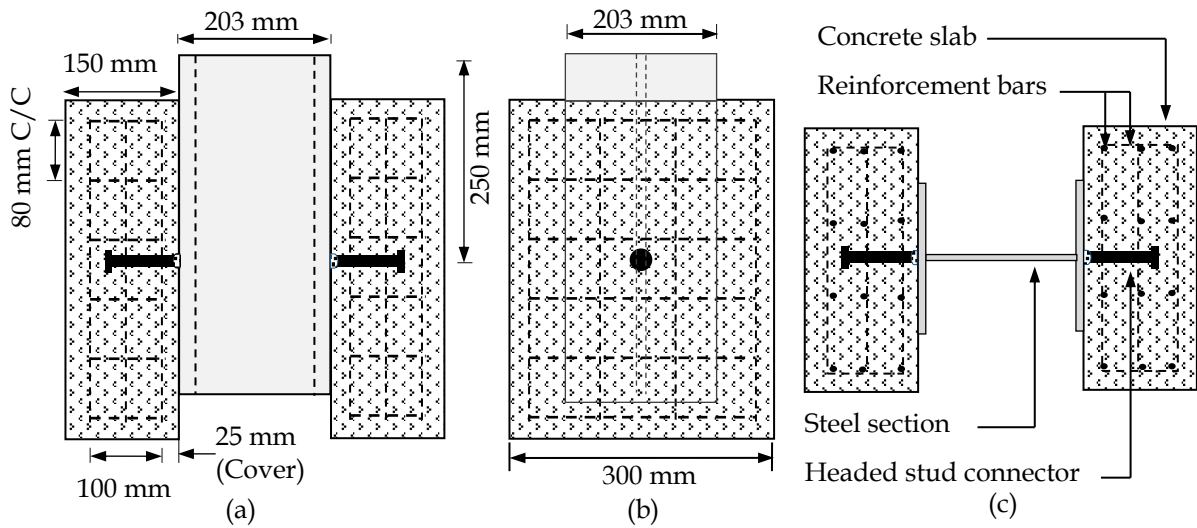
Steel-concrete composite specimen with triple reinforcement layer at 25 mm from root of stud; (a) front view, (b) side view and (c) top view
